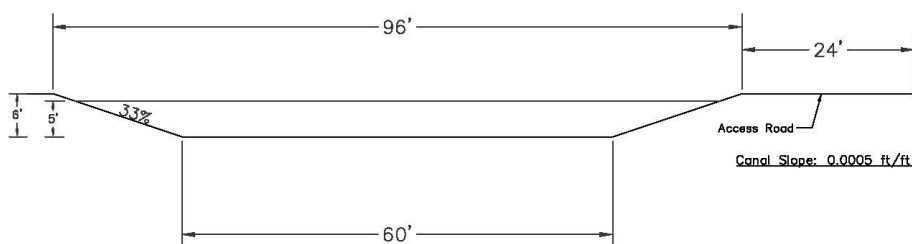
Bypass Canal Section – 1,500 cfs Capacity
